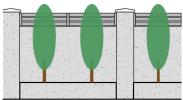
Non-permeable fencing – rendered masonry wall to 1600mm with permeable infill panel above
